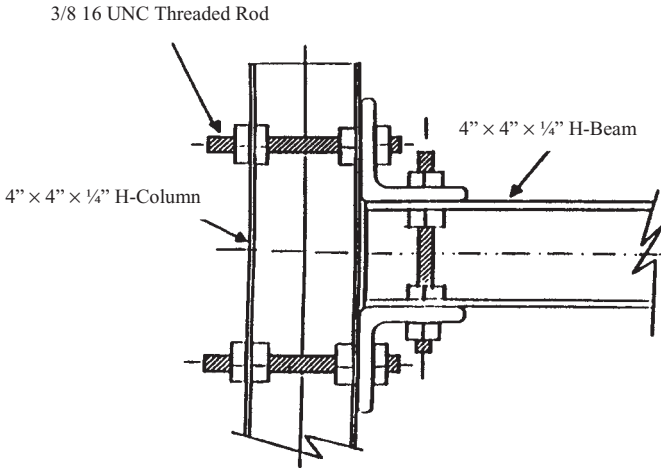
Typical geometry, dimensions, and details of the PFRP exterior frame connection specimens.
